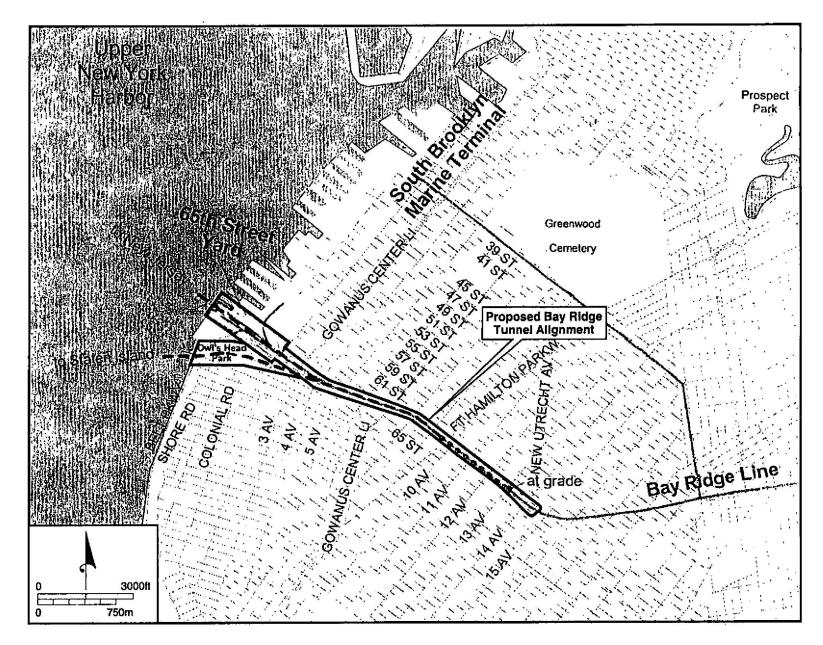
Detail of Project plans showing the locations of the 65th Street Rail Yard and Bay Ridge Tunnel Alignment (the Project Area).
